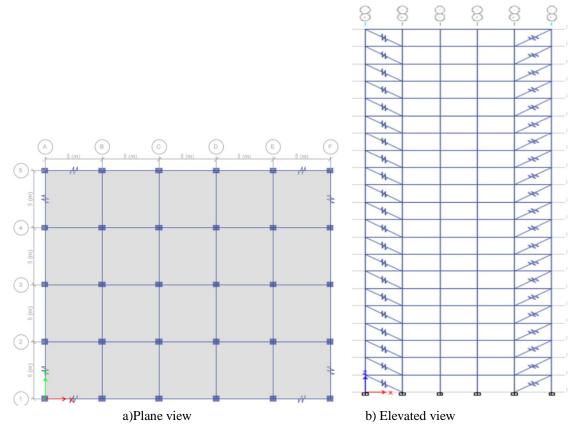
a) b) c) Plan of frictional Dampers (FD)
